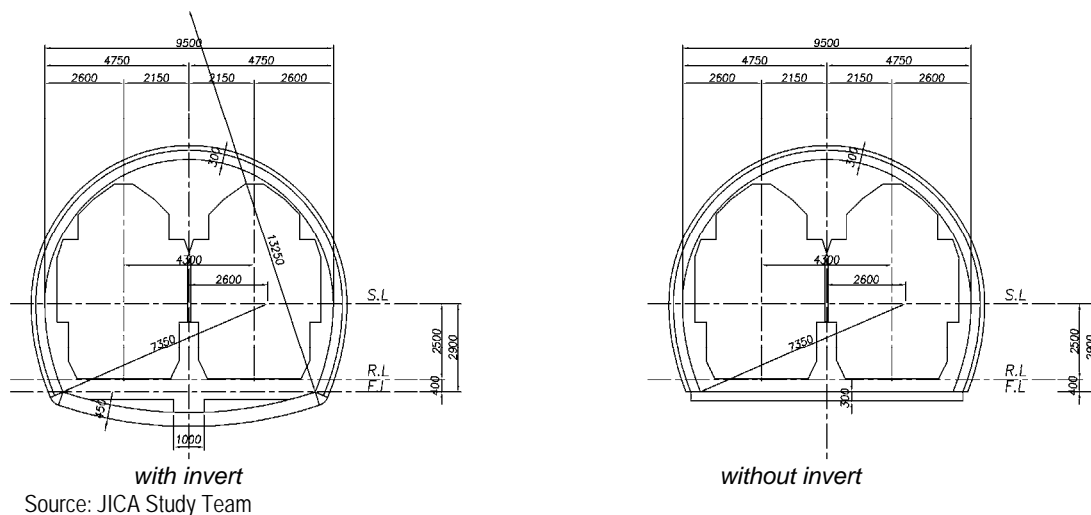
Standard Cross-section of Tunnels for HSR
